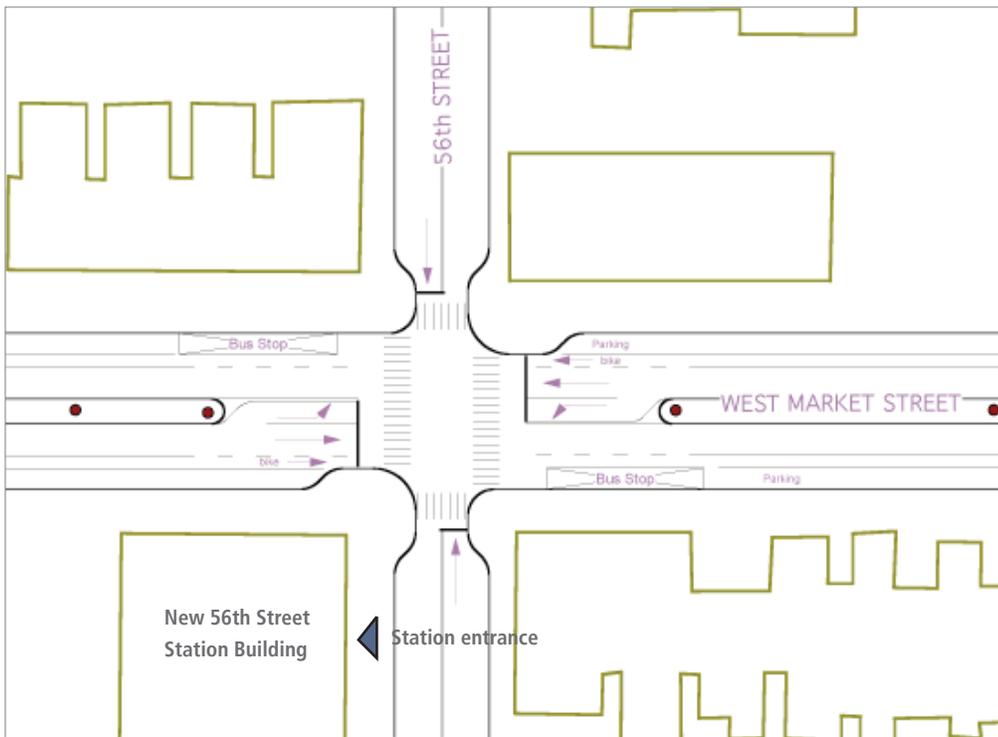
Street Layout at Market and 56th Streets following the reconstruction of the EI
